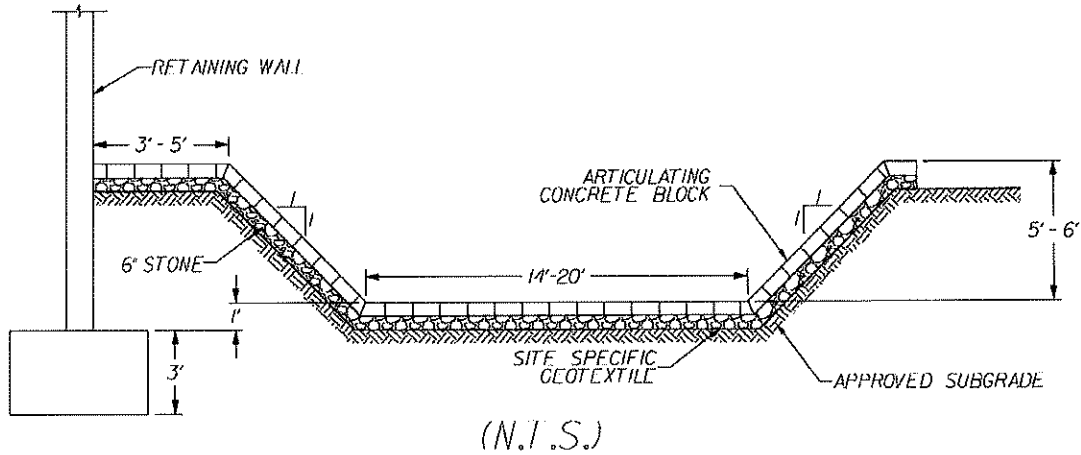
Typical detail of the proposed retaining wall adjacent to Colvin Run channel.
